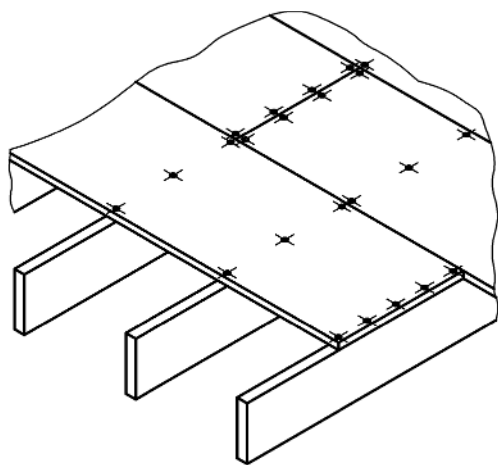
Tongued and grooved structural decking laid across the joists with short edges supported on joists
